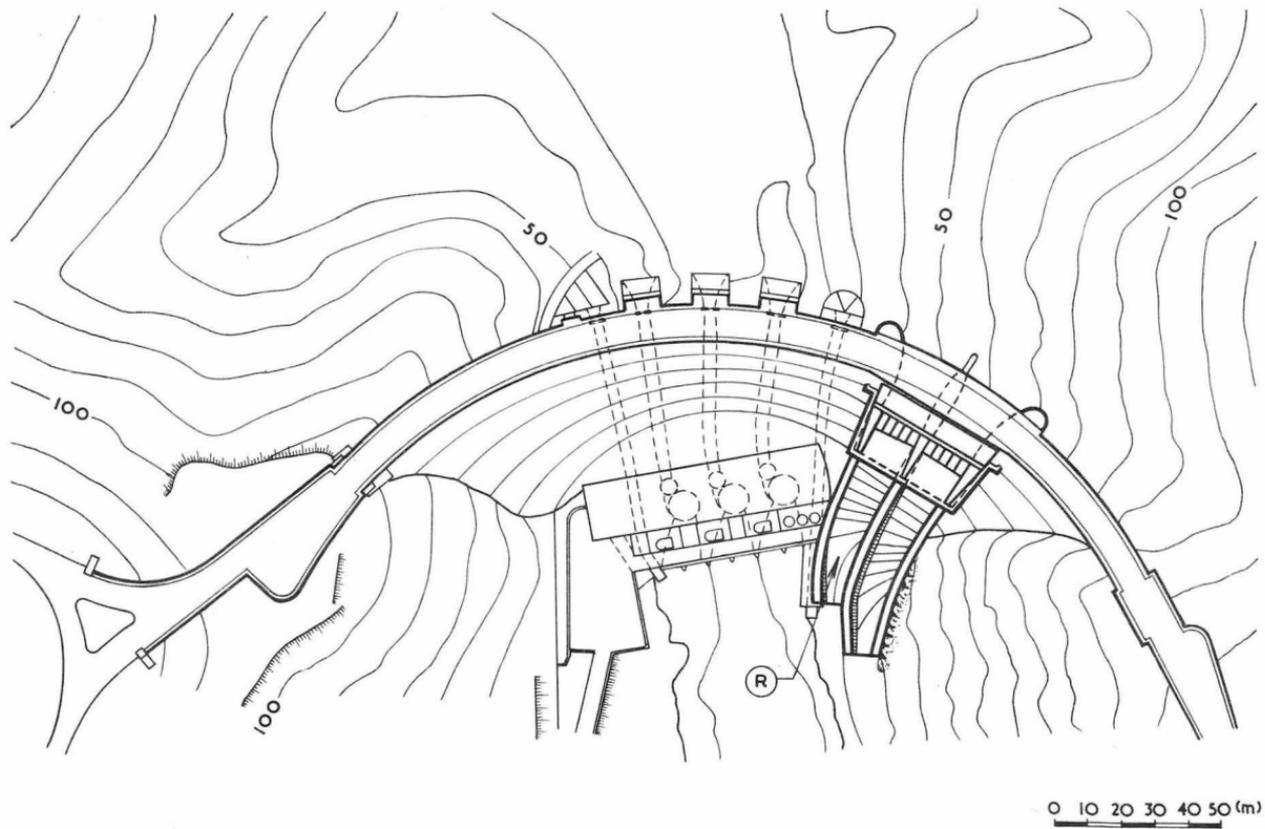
CASTELO DO BODE — PLAN OF THE DAM, POWER STATION AND SPILLWAY
